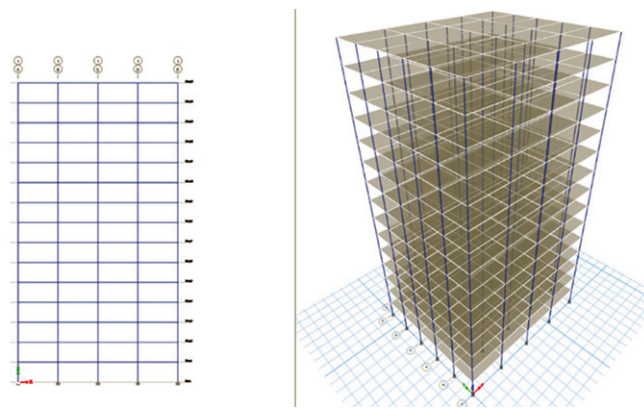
Views of the Mass Irregular-2 Model in elevation and 3D for both composite and RC buildings
